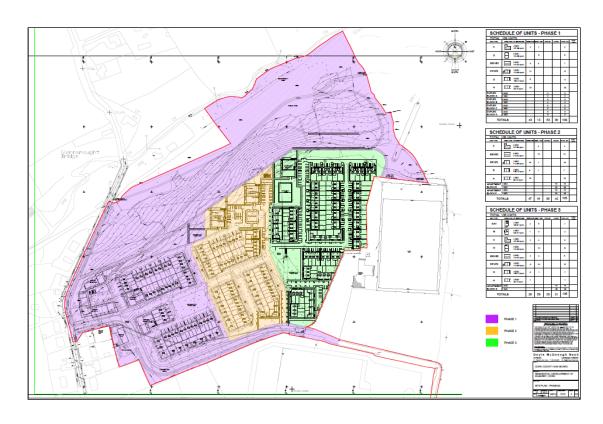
Proposed Phasing Plan (DMNA Architects)
